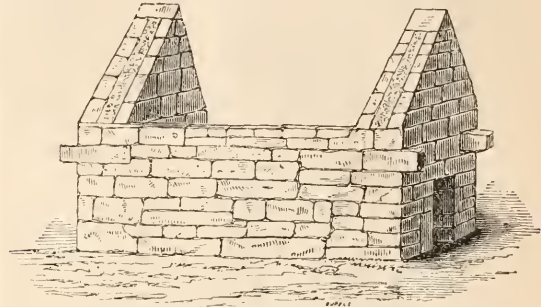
North elevation of a small Church, showing the hand-like projecting stones.
